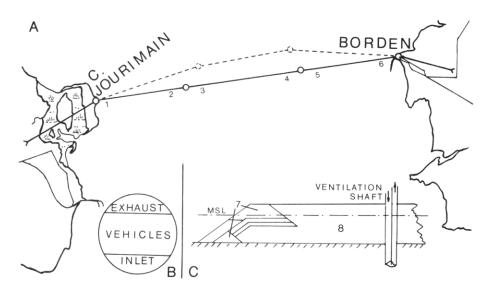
Option IV. A: Possible position of ventilation shafts in the Strait. 1-6, ventilation zones in the tunnel. The dashed line is an alternative position which would put the shafts through exposed rock bottom. B: Diagram of tunnel cross-section. C: Cross-section of protective island. 7, armour stone, 5 kg to 7 tonnes; 8, rock spalls and consolidated sand.
